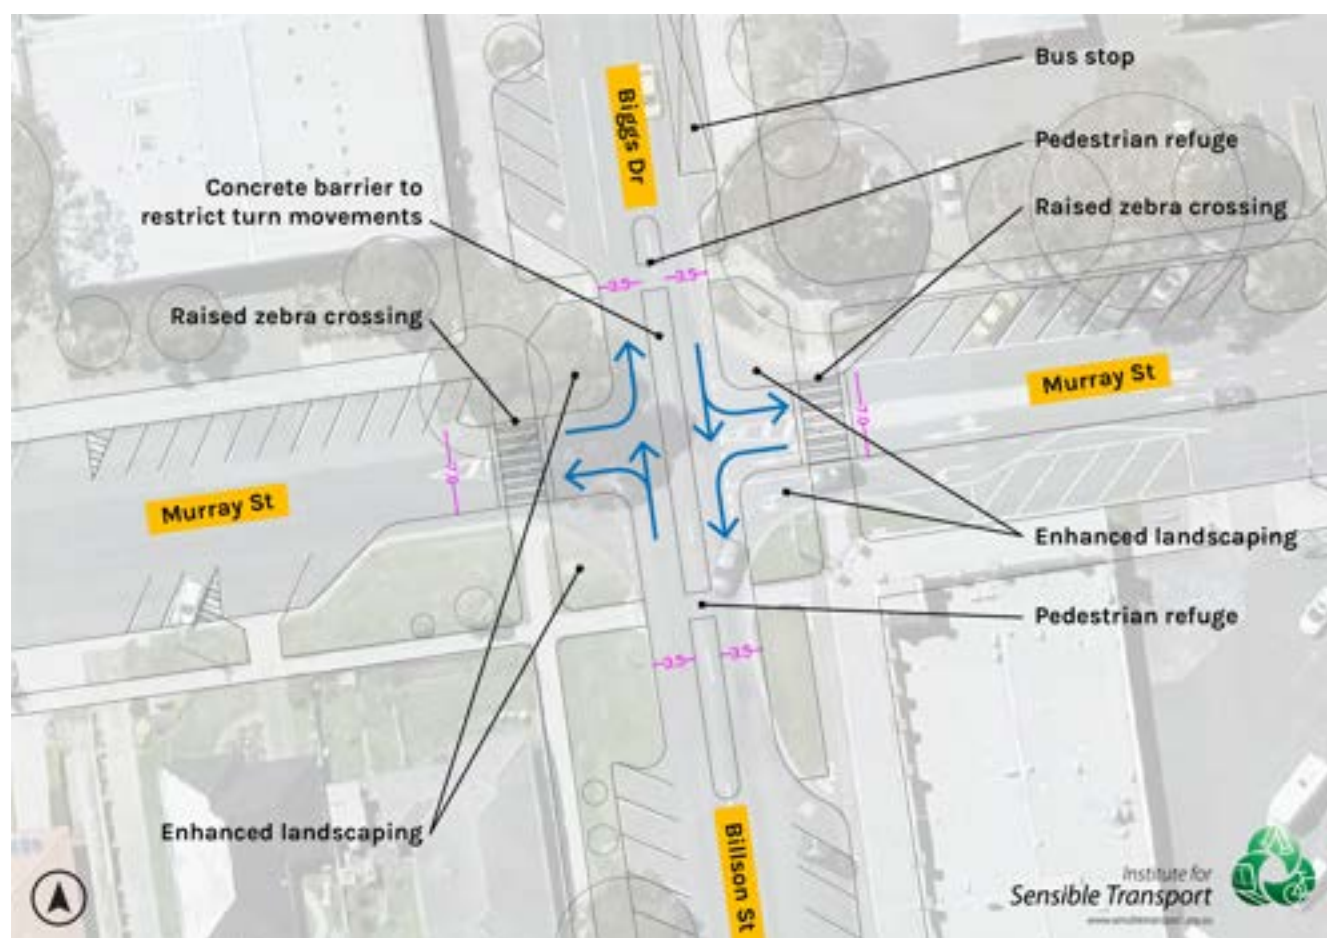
Redesigned intersection of Biggs Drive/Billson Street and Murray Street
